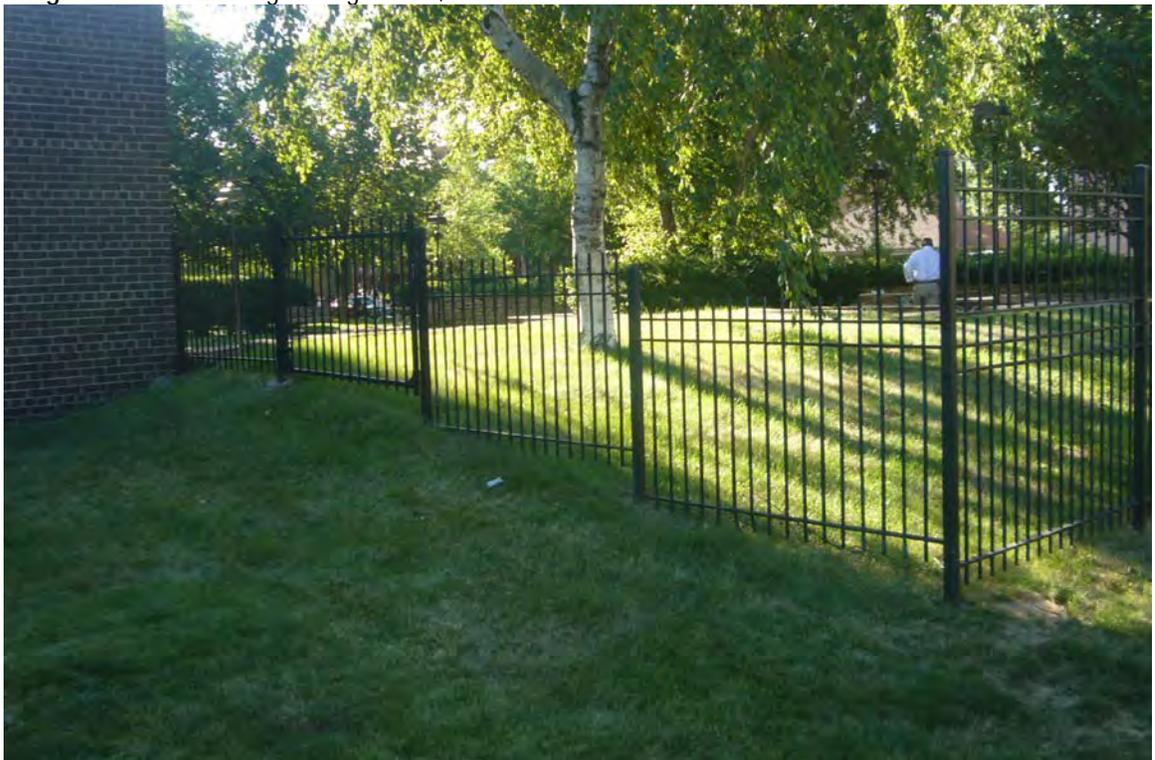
Existing 4-0 high fence, Park Avenue side looking south
